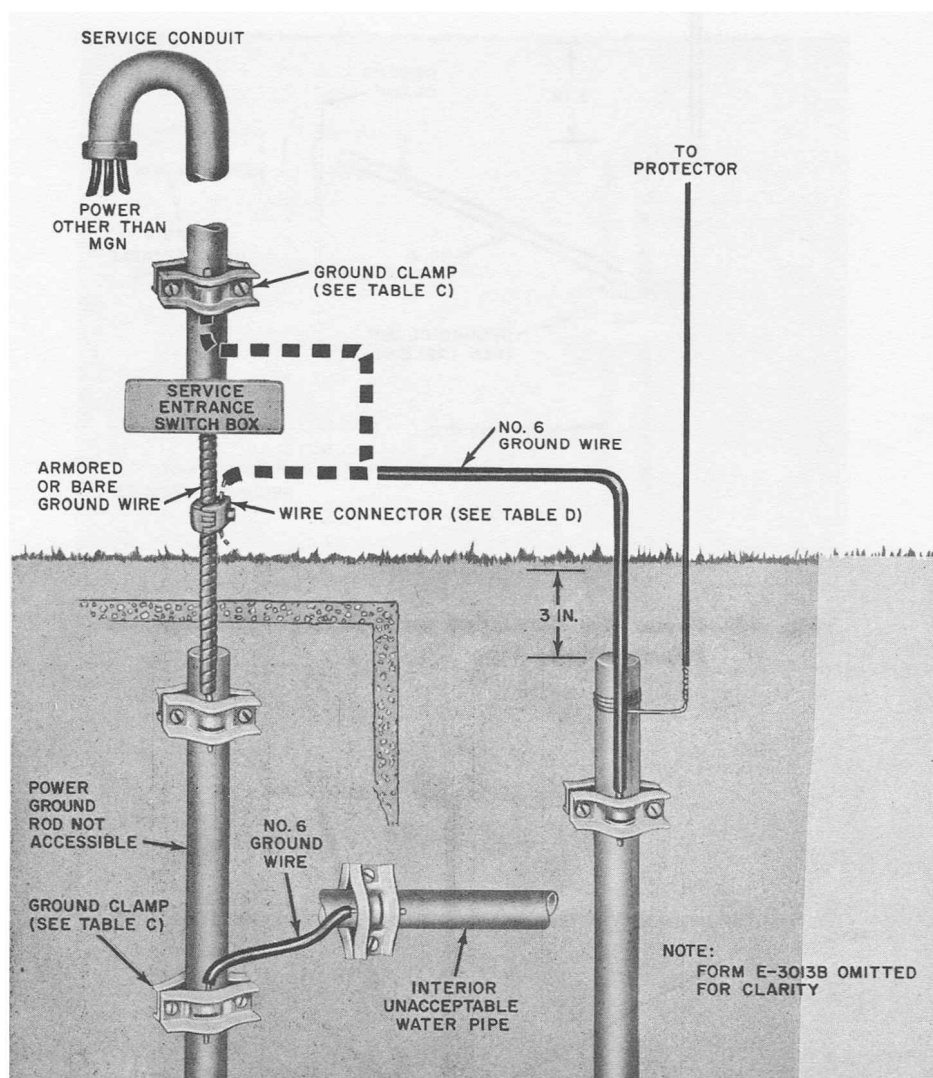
Power Other Than MGN Grounded to Inaccessible Ground Rod—Unacceptable Interior Water Pipe
